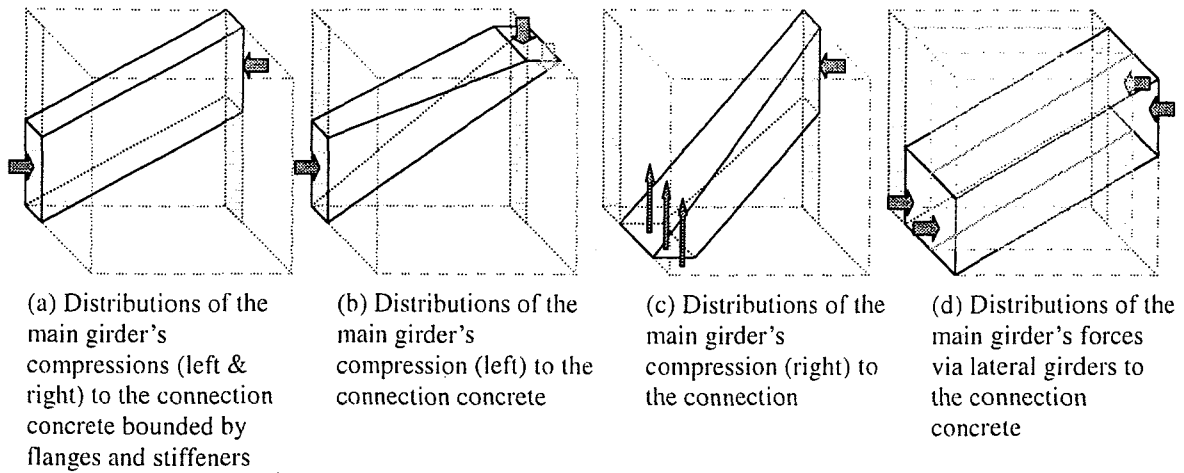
(b) Force transfer mechanisms inside connection concrete of specimen C-4. (established to resist main girder's forces)
